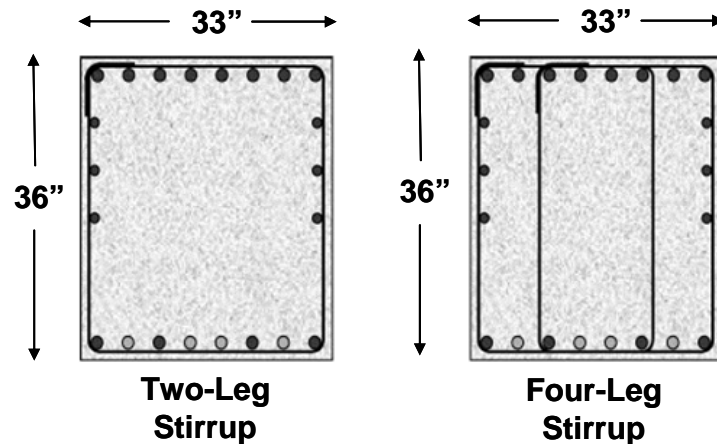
Bent cap cross-sections (Powanusorn and Bracci, 2006)
